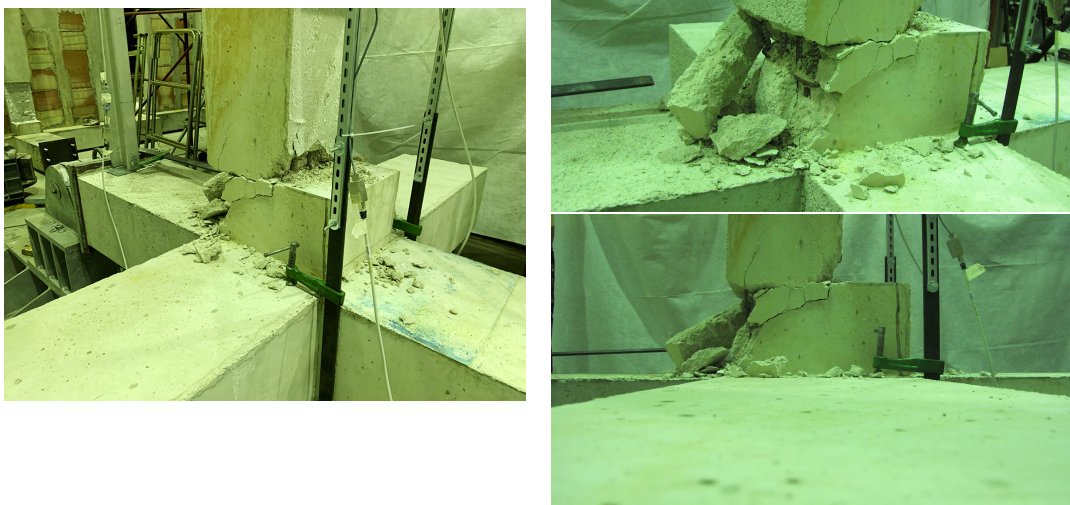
Final damage in the beam of J_02 – C specimen.
